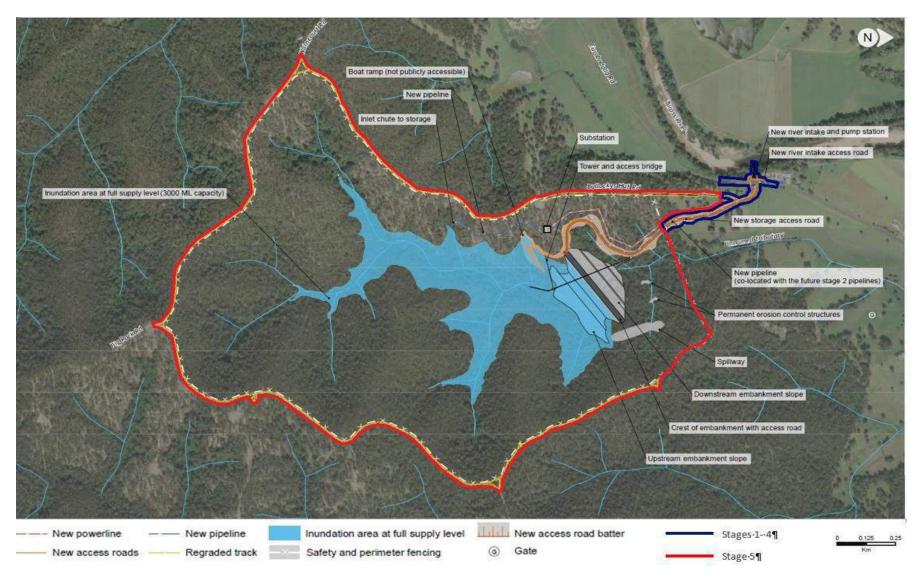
Project overview and scope of works covered by this plan (Stage 5)
